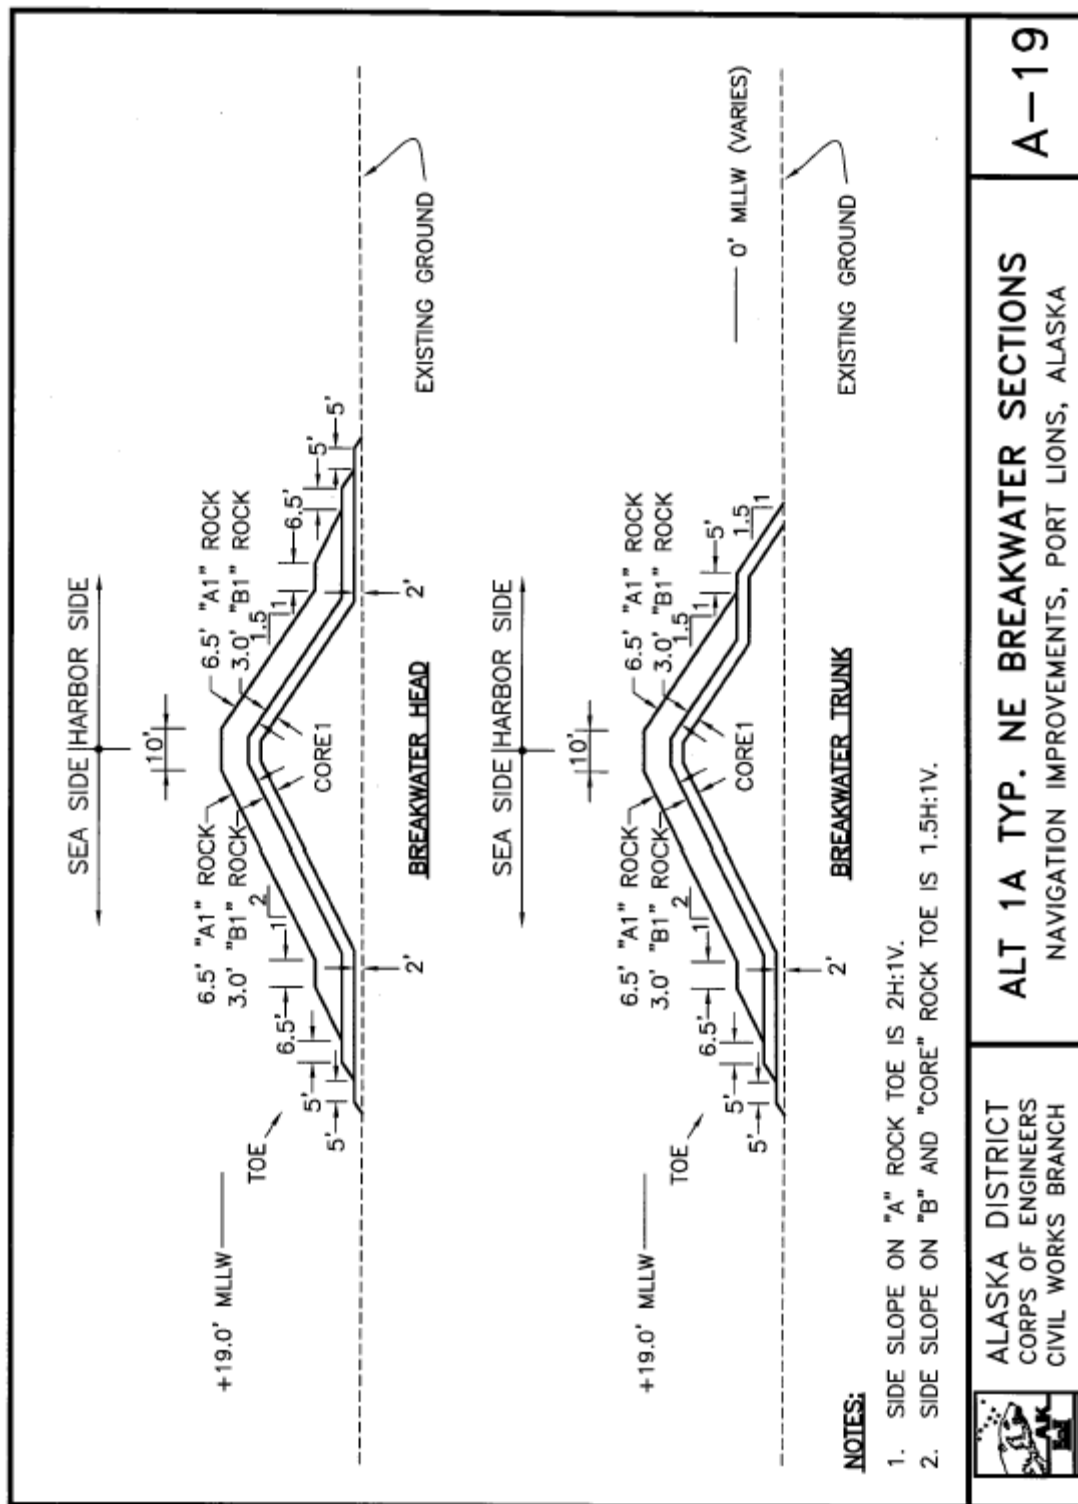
Alternative 1A - Typical NE Breakwater Cross-Sections
